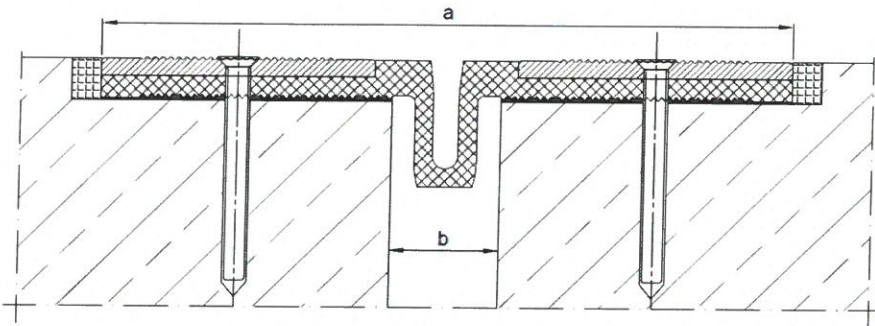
CONECTO PARK SL 190.30.W waterproof expansion joint profile – recessed installation
